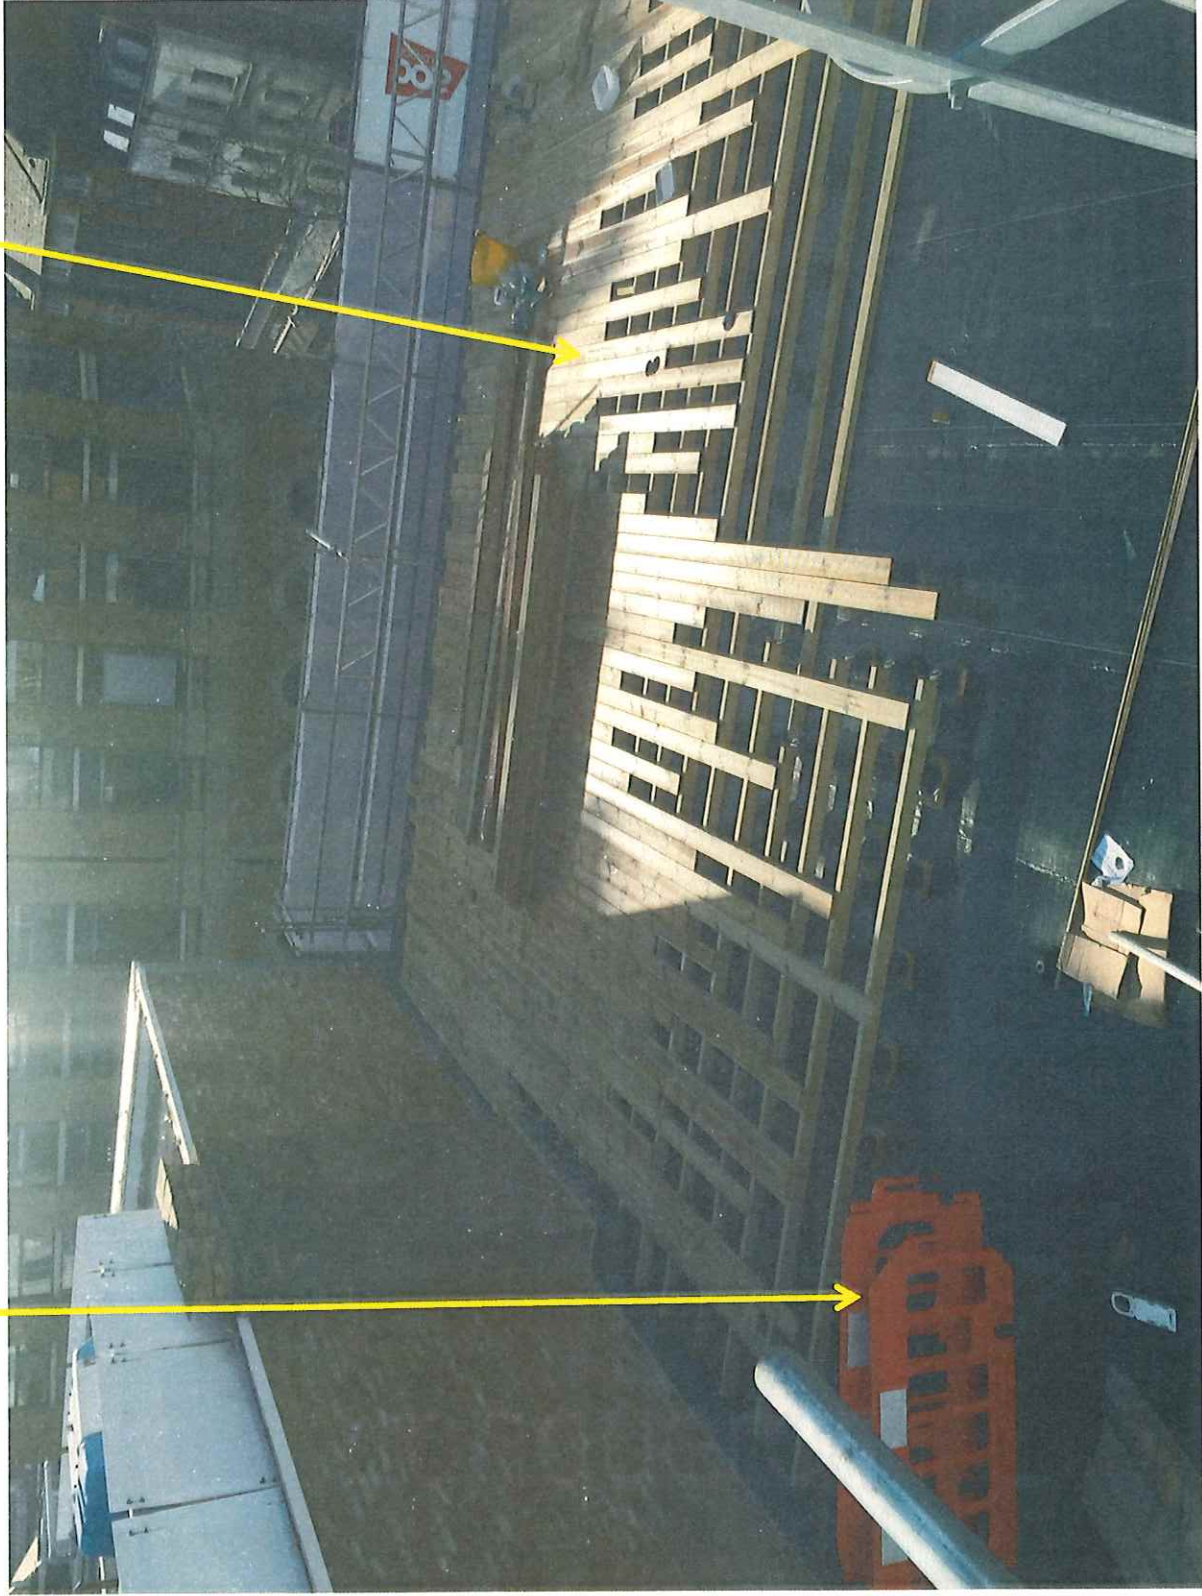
PHOTO D: View from 5th floor roof looking down onto front fourth floor terrace area
